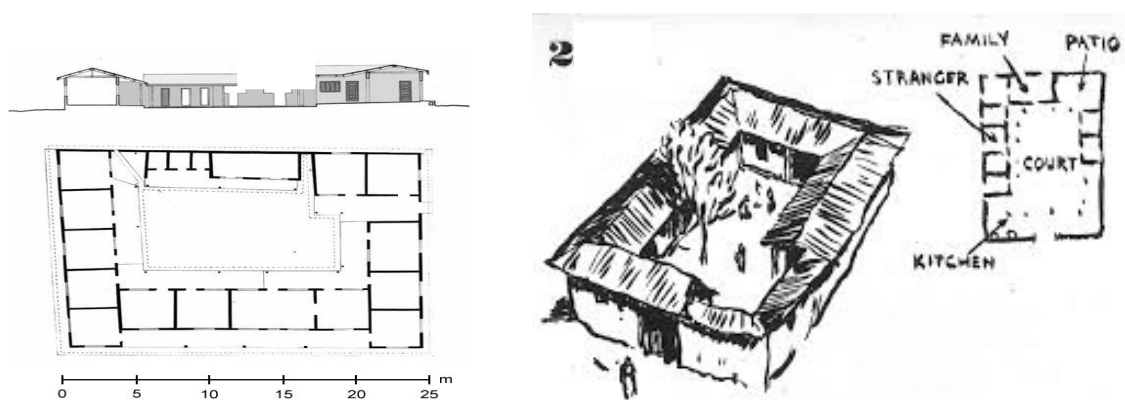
Plan and elevation of a typical single-banked compound house in urban Ghana
